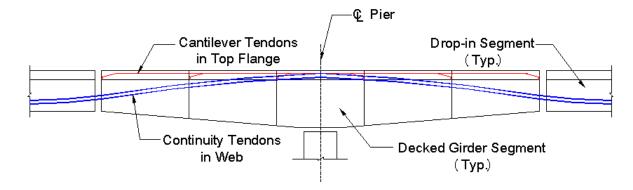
Balanced Cantilever Construction of Spliced-deck Girder Segments near Piers
